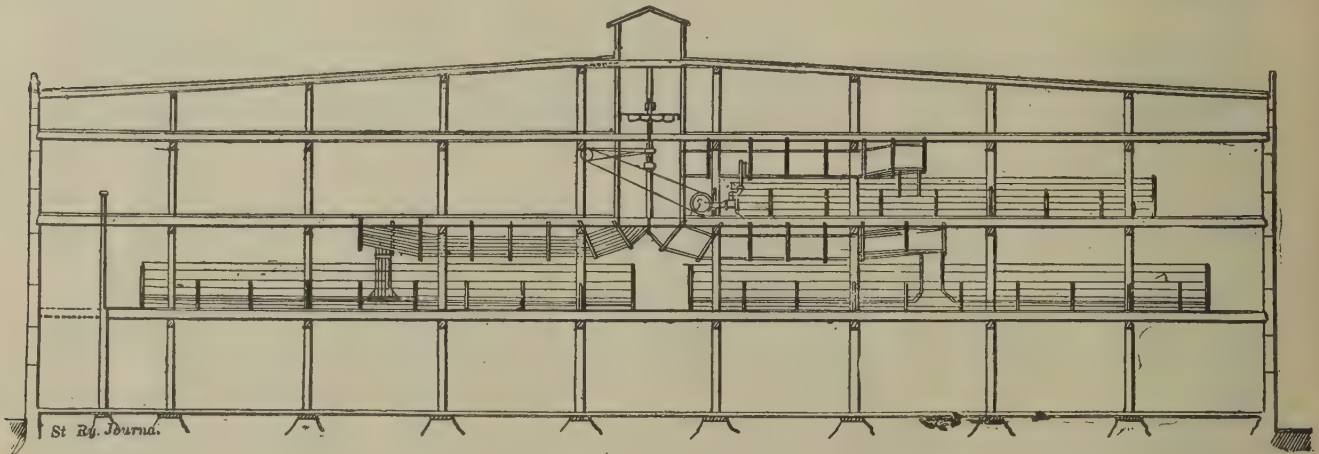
MECHANICAL FLOOR VENTILATION.
